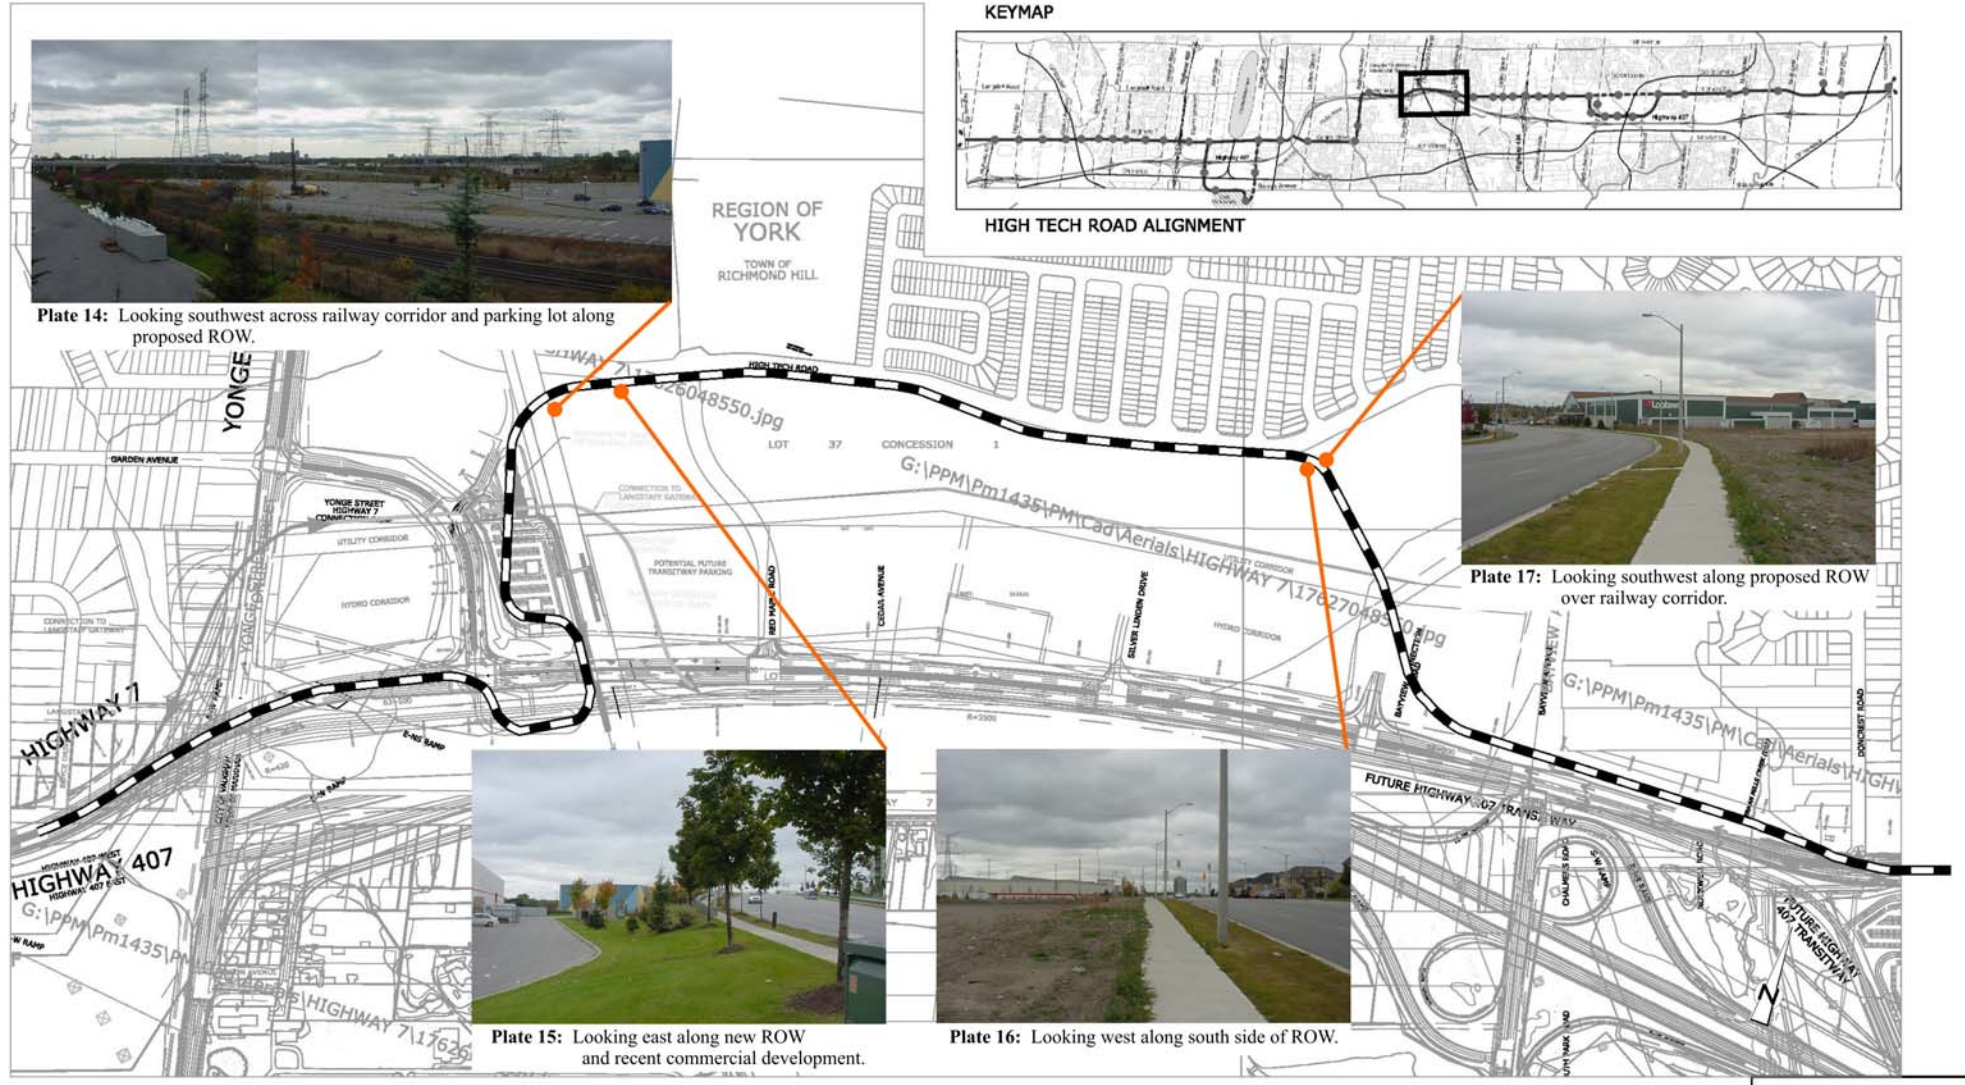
Looking southwest across railway corridor and parking lot along proposed ROW.
